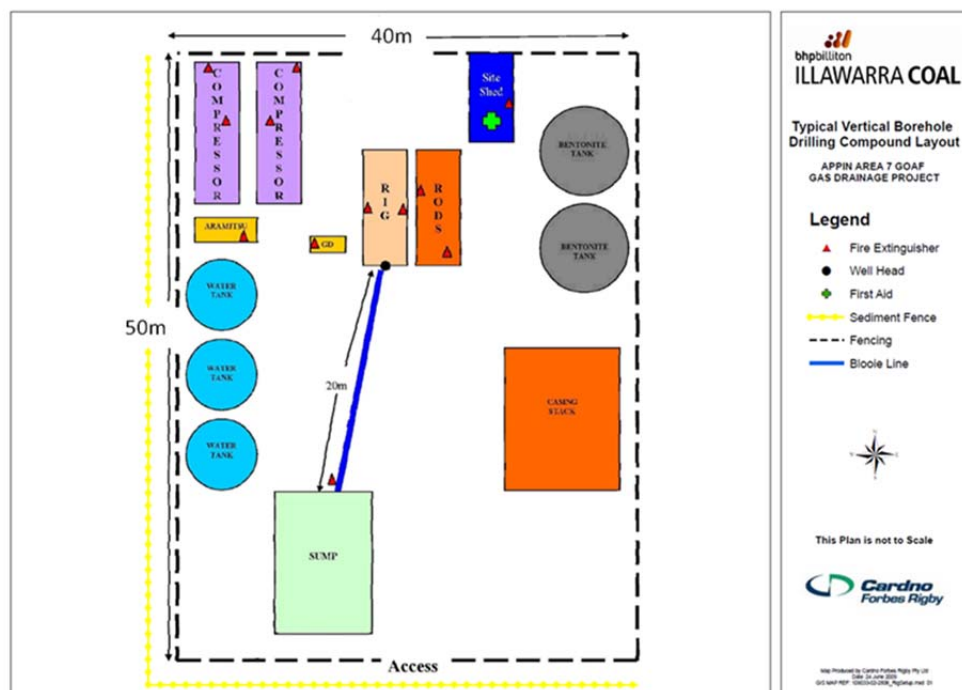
Typical Vertical Goaf Drainage Well Drilling Compound Layout
